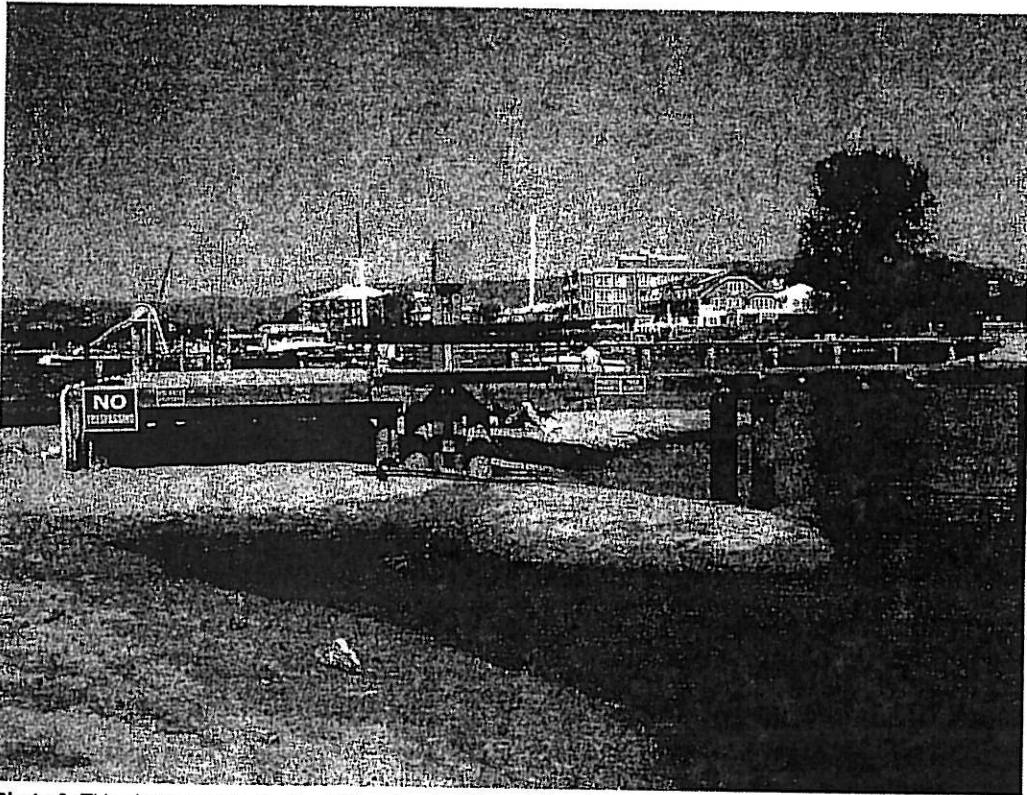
This photo depicts the boat lift and end of the existing dock. Note that both occur over an accreted sand beach; the end of the dock was approximately 0.75 m above the sand during the May 16 site visit.
